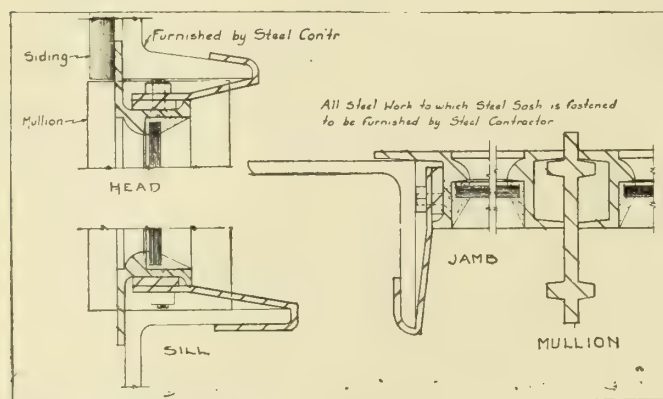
DETAILS SHOWING ALL STEEL MEMBERS USED ON “LIGHTWELL” STEEL SASH CONSTRUCTION
